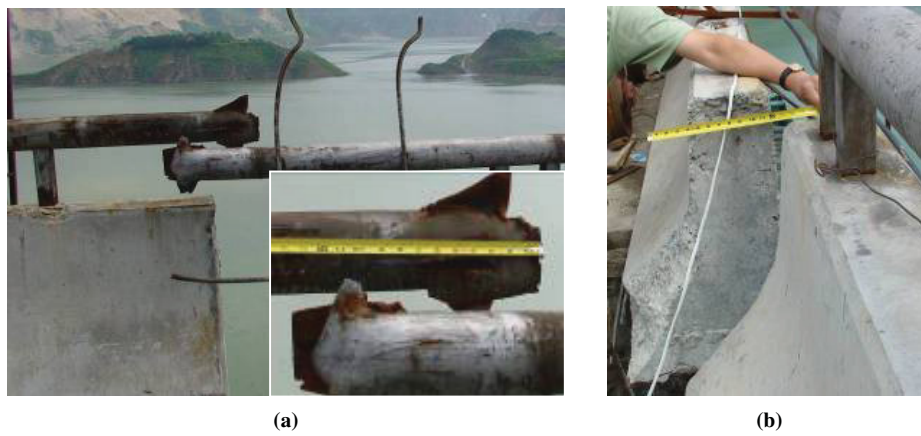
Longitudinal and transverse offset of bridge deck.
